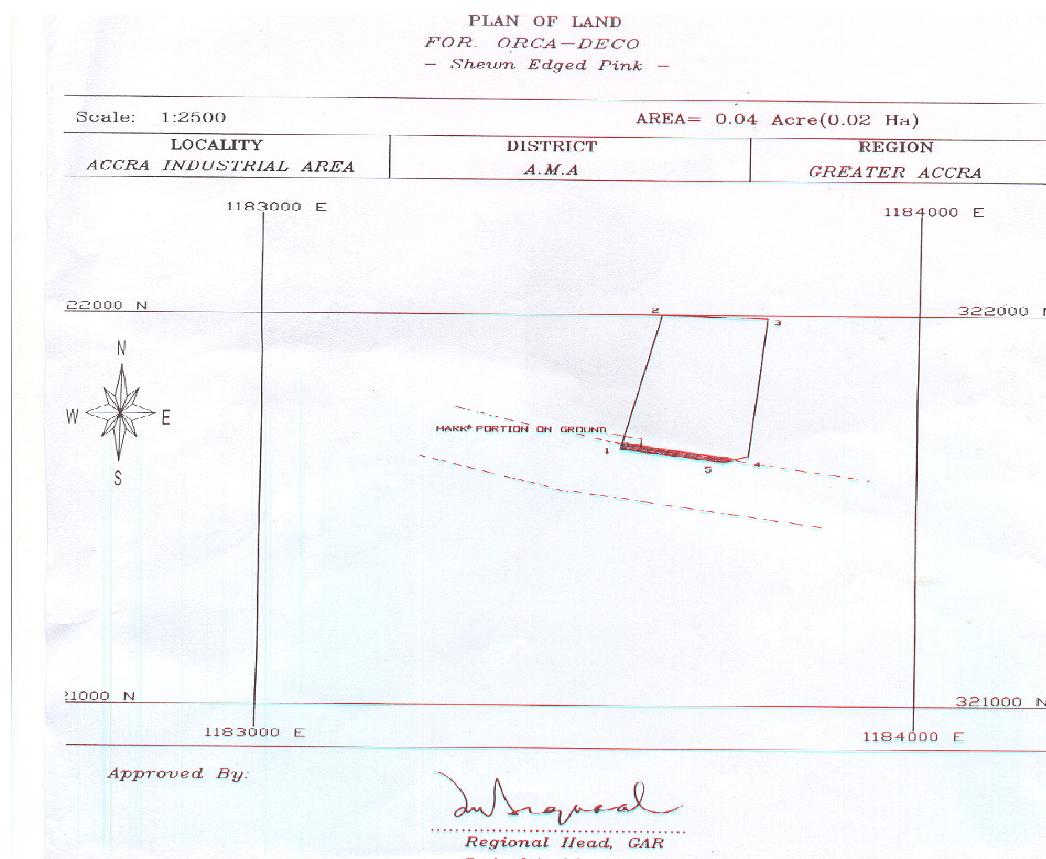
Site Plan of Orca Deco (with the affected area marked)
